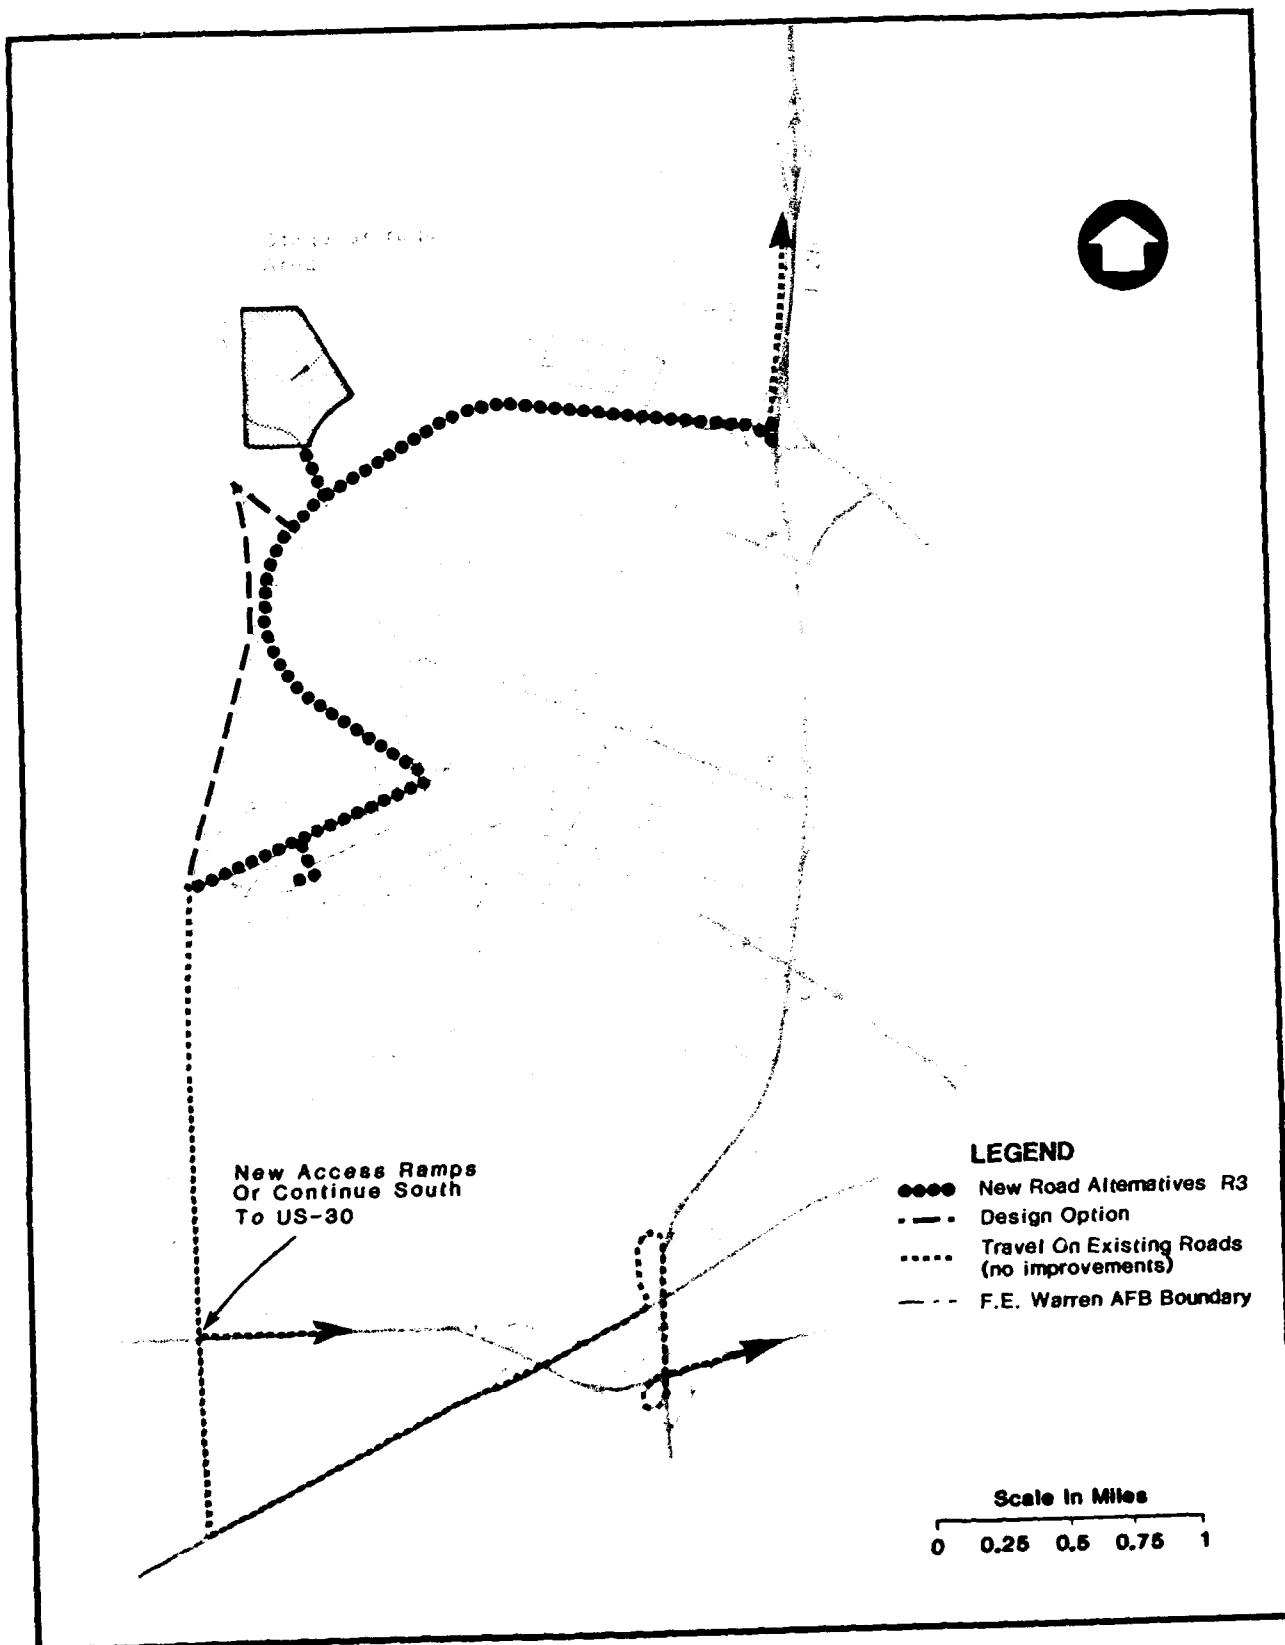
NEW ROADS AT F.E. WARREN AFB:
